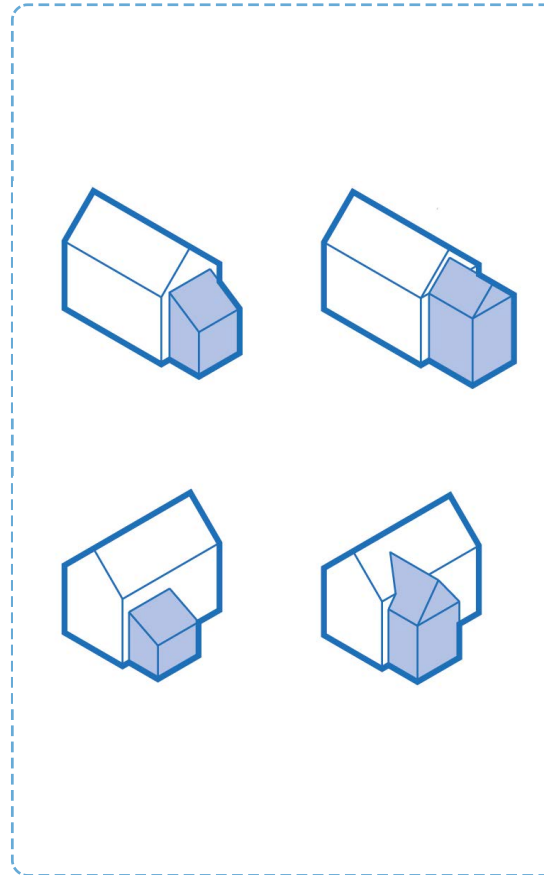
Good example for side extensions that respect the existing building scale, massing and building line.
